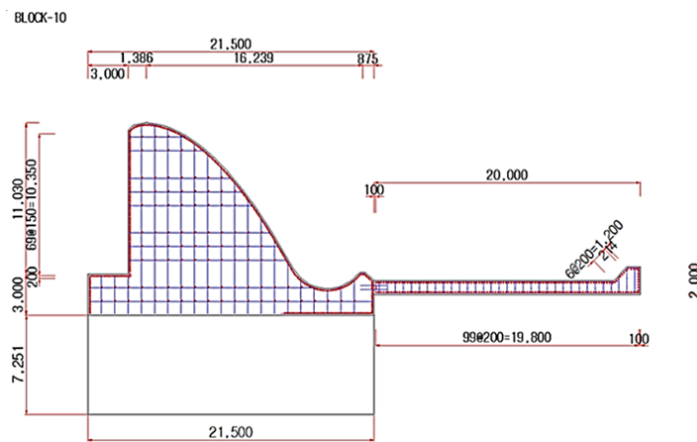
Schematic design of the weir structure for monolith block No. 10 (unit: mm)
